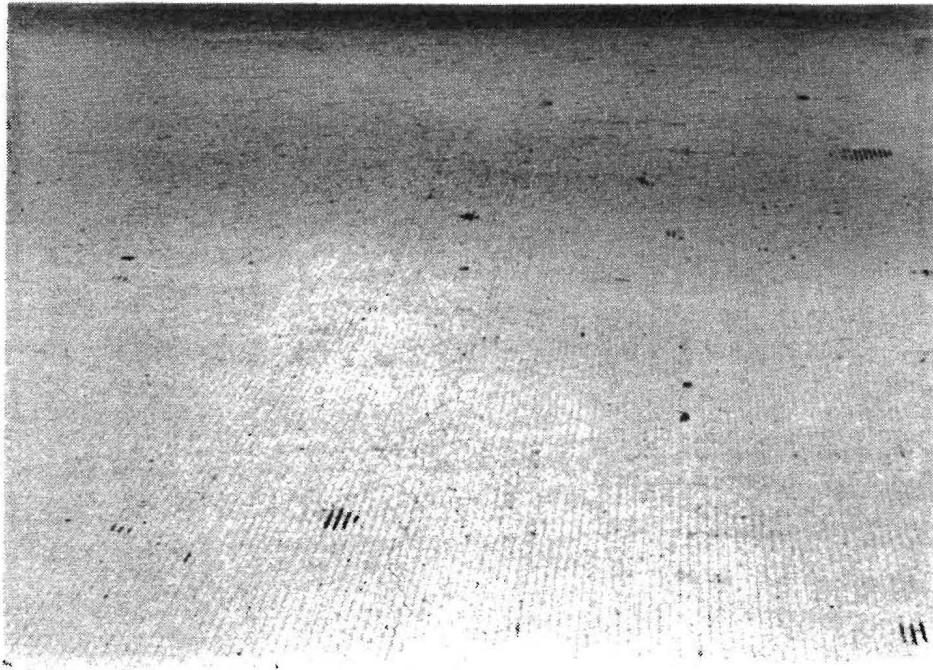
Dense Concrete Overlays on Bridge Deck
